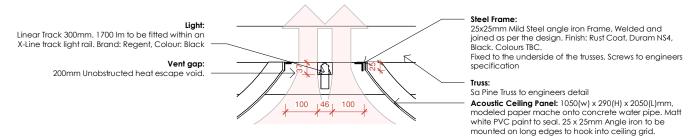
Sectional detail: Workshop section, (Author, 2021)
